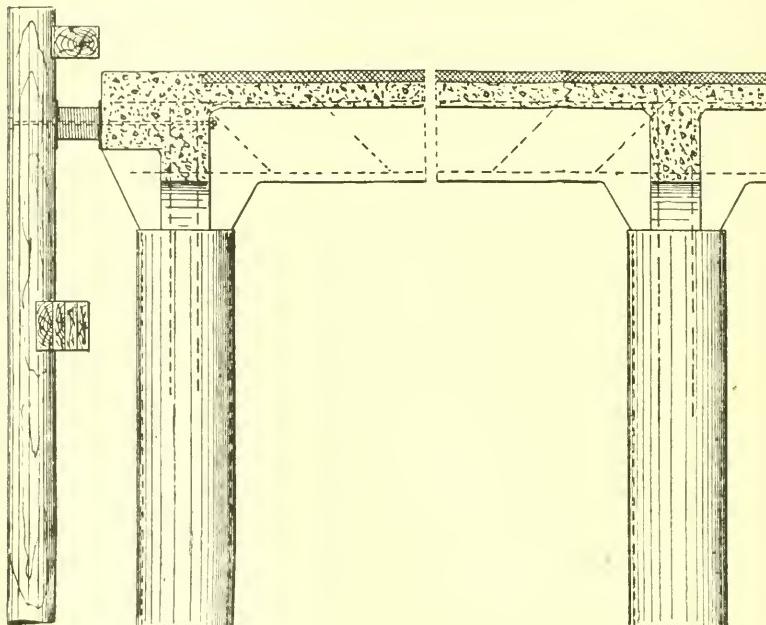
shows these casings in the construction of trestle bents or piers, with cap of wood or steel, anchored to the interior
